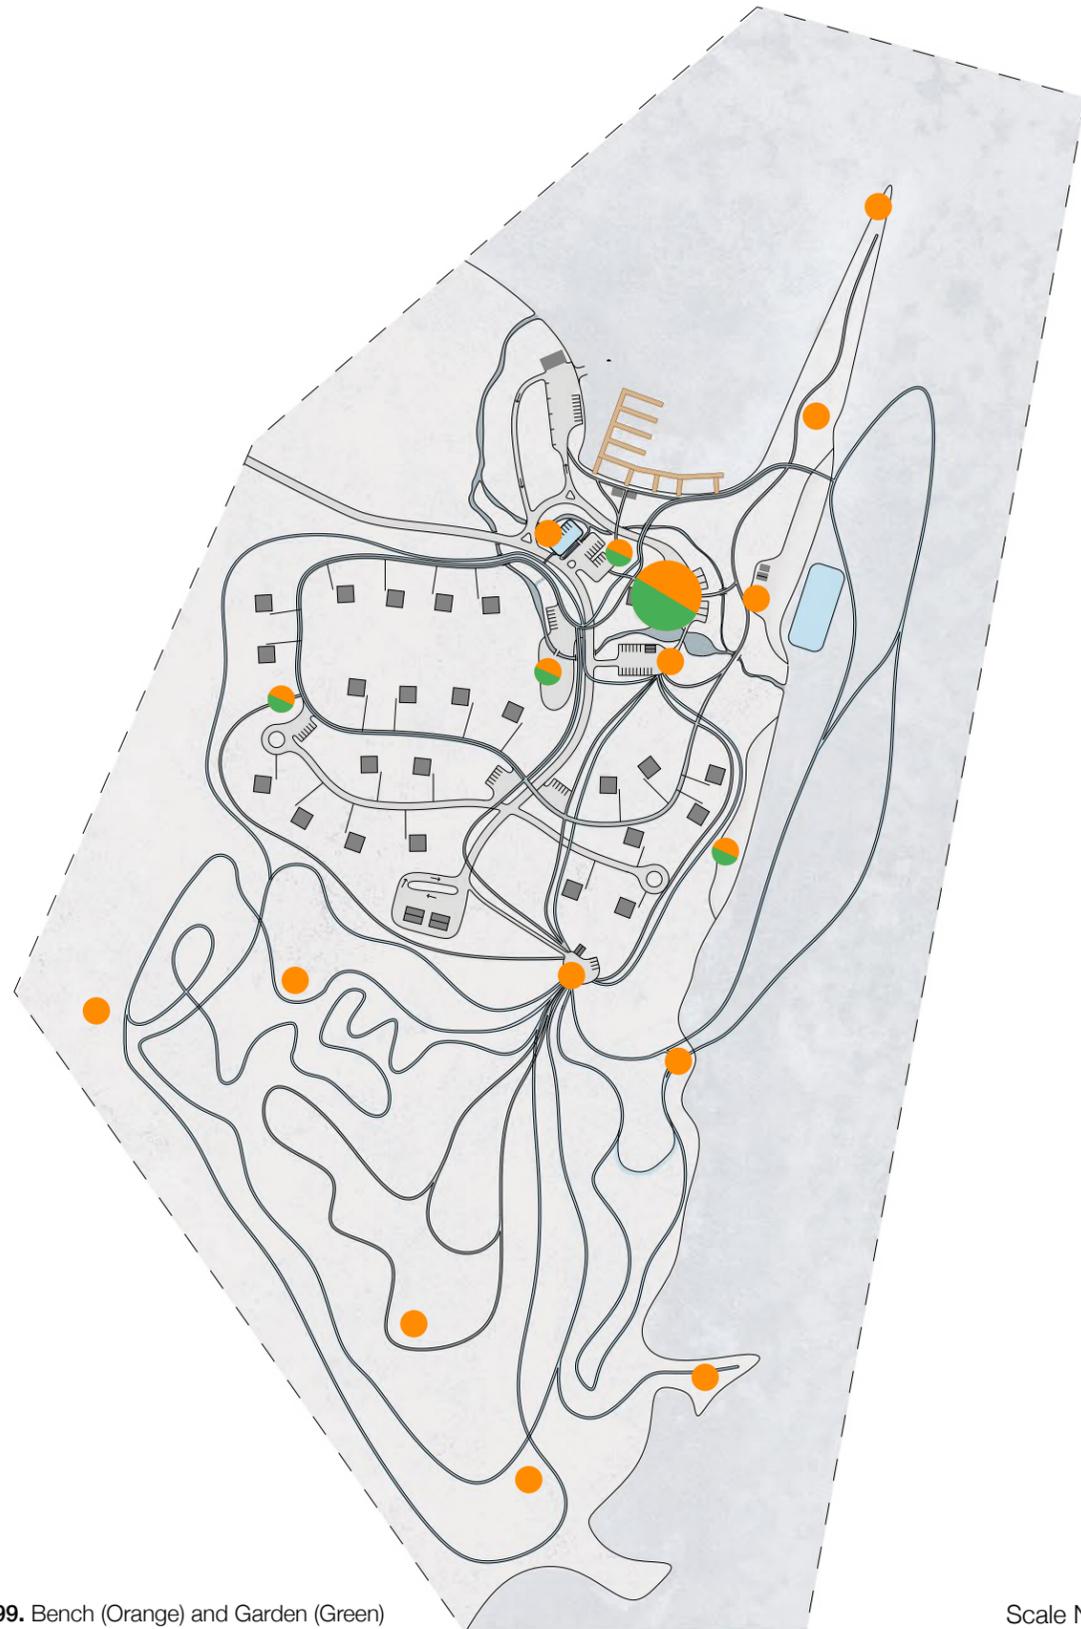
Bench (Orange) and Garden (Green) Locations Throughout Community
